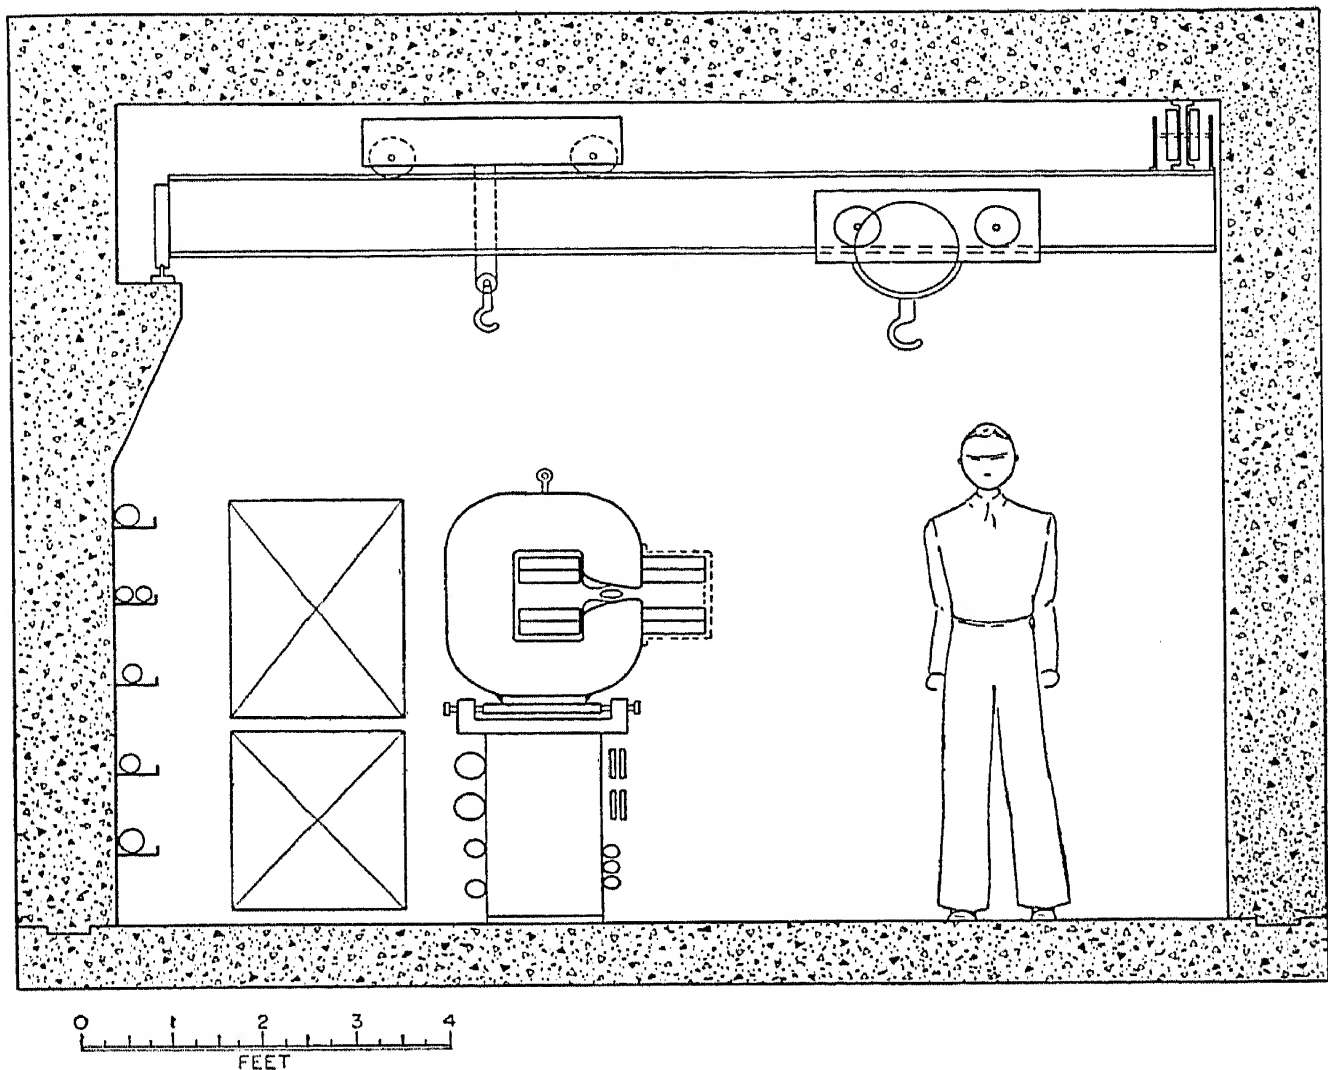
Tunnel building for an alternating gradient synchrotron (proposed design).
